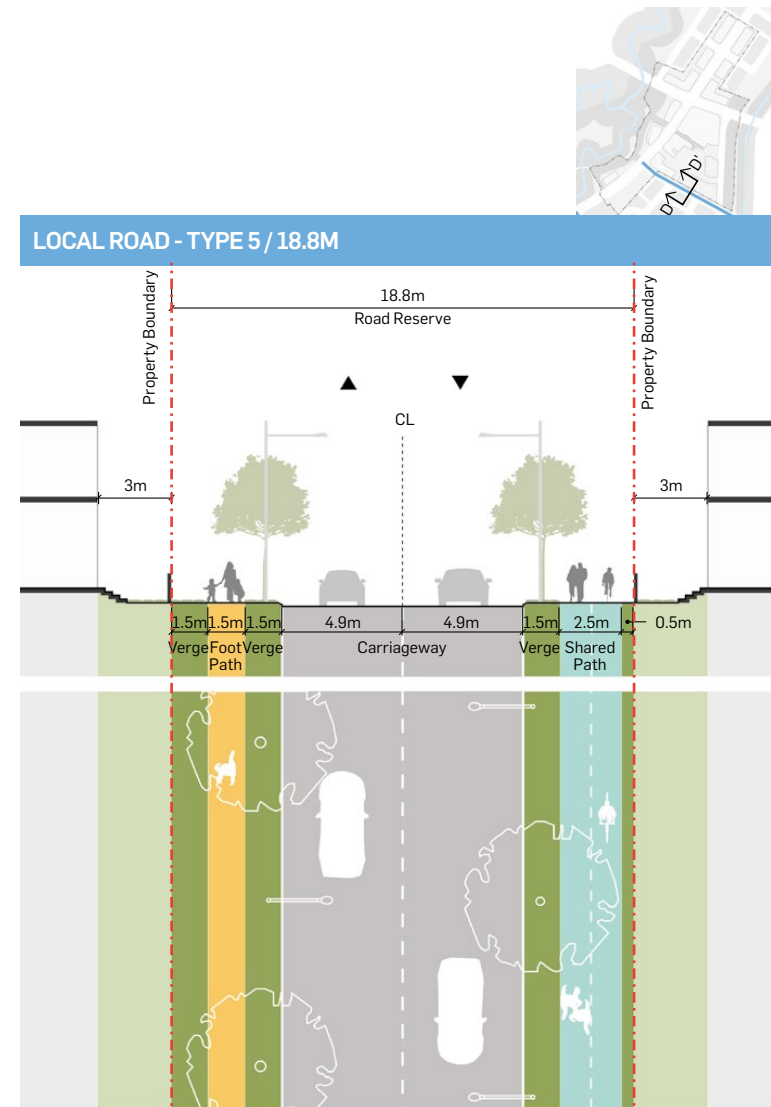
Indicative Street Section D-D' - Local Road - Type 5
